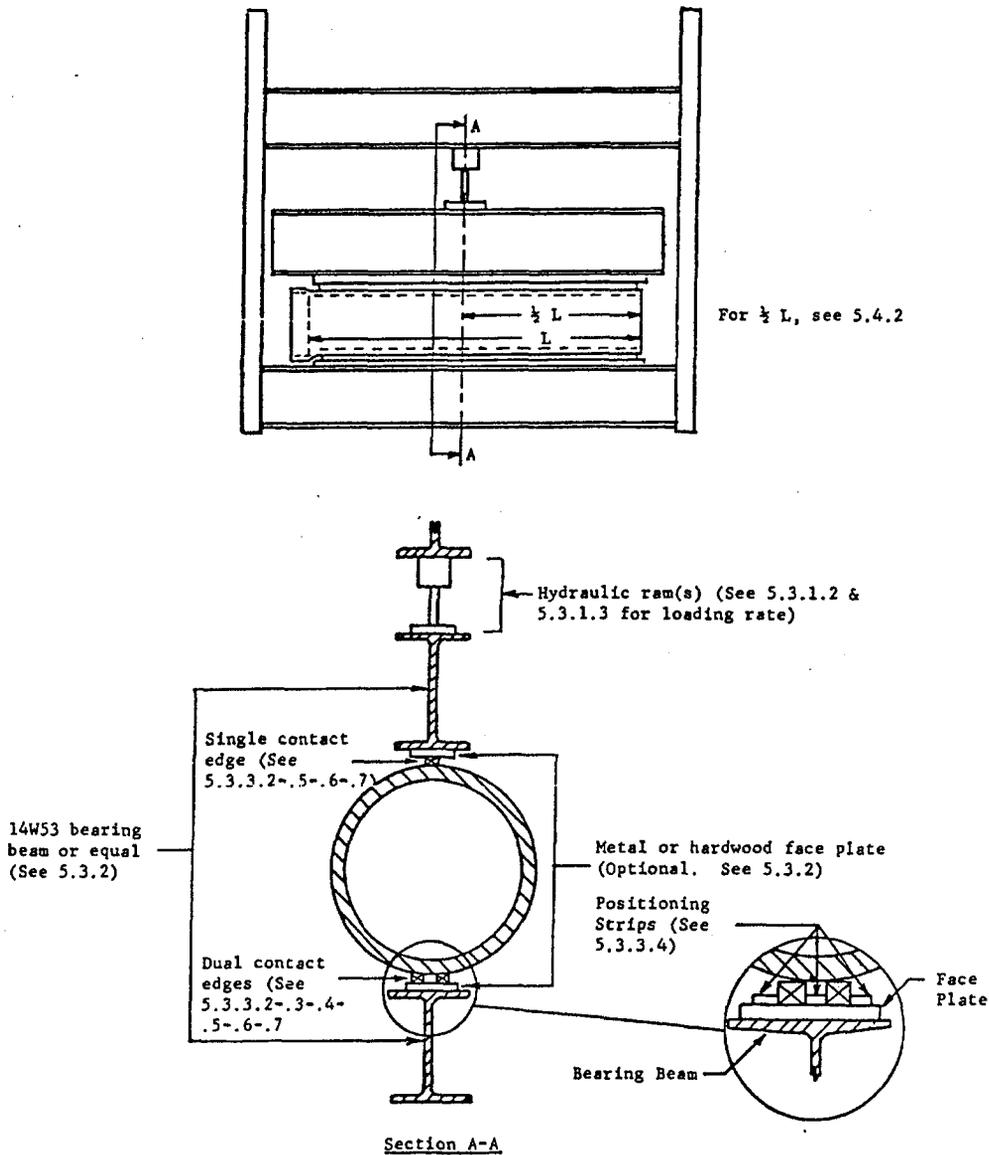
Three-Edge Bearing Testing (see 5.3.4 for Segmented Testing)
